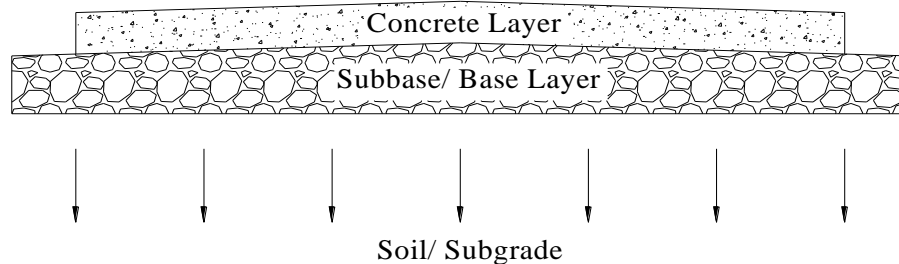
Cross section along the depth of a rigid concrete pavement
